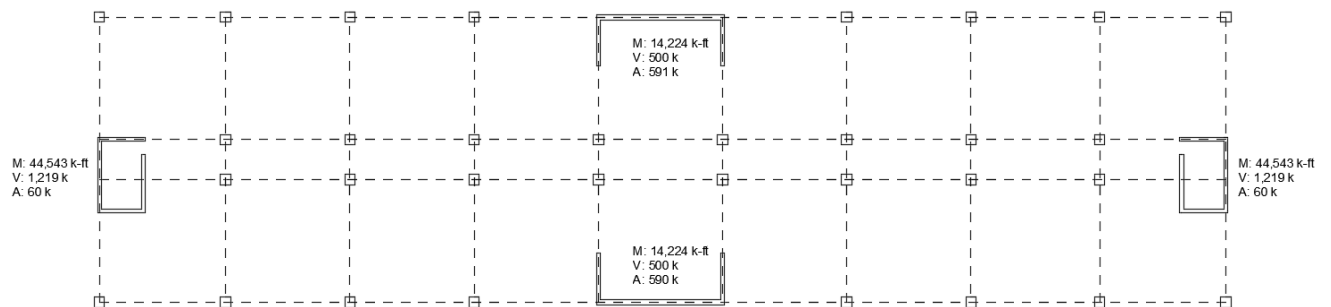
ETABS output of axial load, shear force and bending moment at the base of each structural wall 2nd floor
